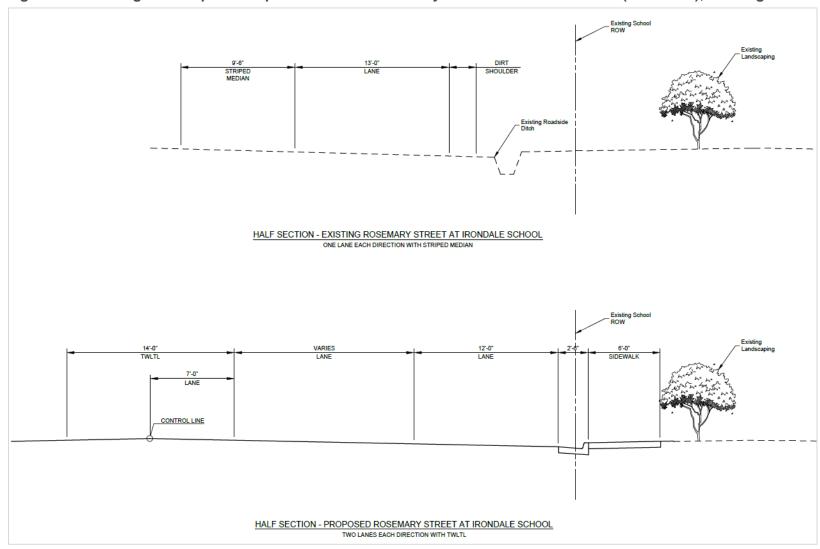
Existing and Proposed Improvements to Rosemary Street at Irondale School (5AM.3975), Looking North
